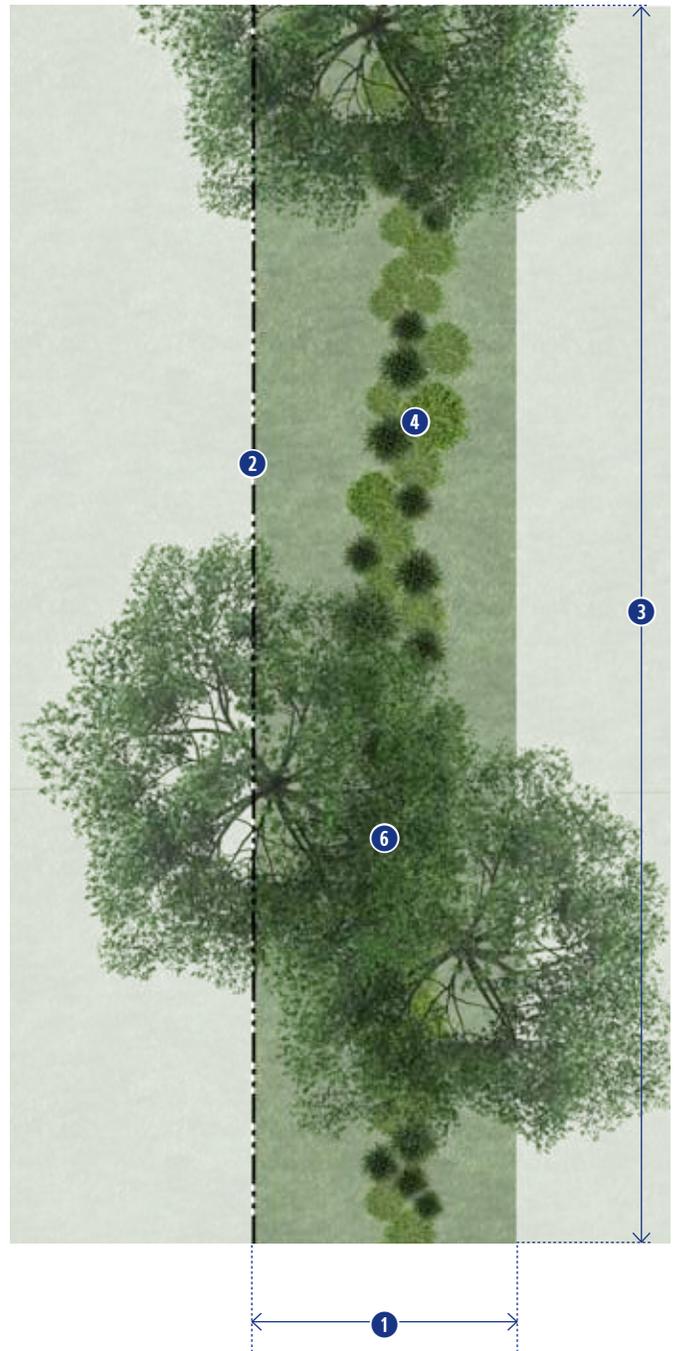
Landscape Screen Requirements & Plan Illustration
